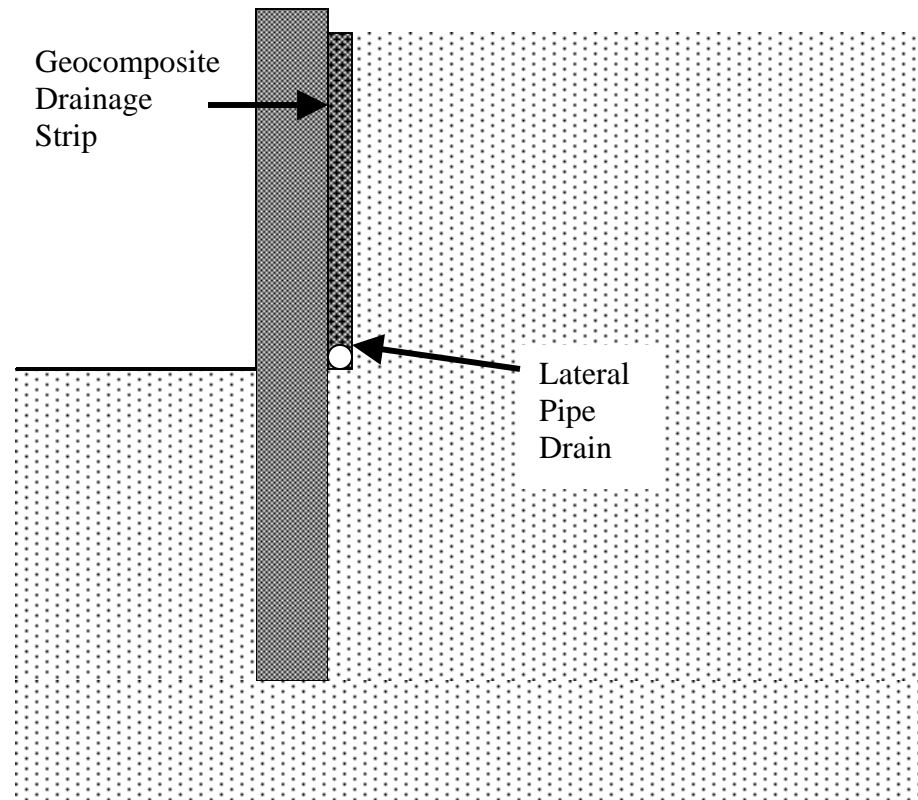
Geocomposite Used as a Drain Behind a Retaining Wall.
